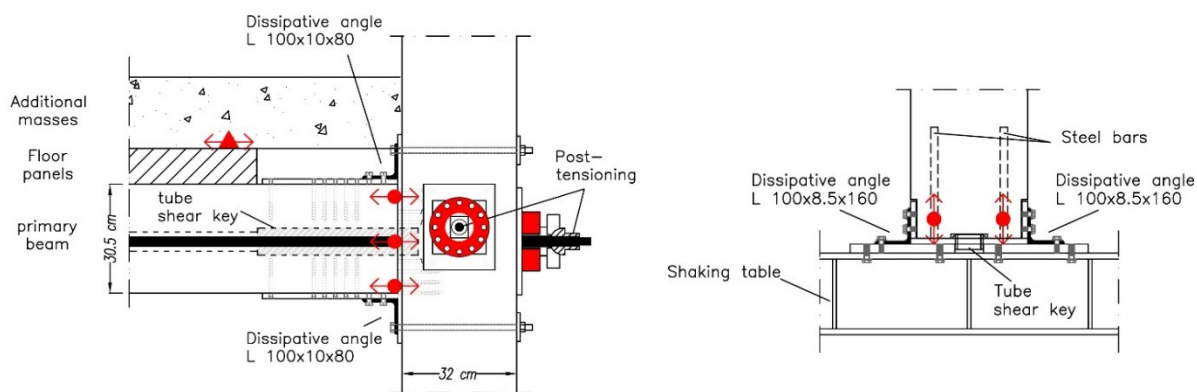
shows the construction details of the beam to column joints and of the column to shake table connections. The beam-column joints (Figure 27a) were composed by a single 26.5 mm diameter steel bar crossing the beam, with  $f_y = 1050$  N/mm<sup>2</sup> yield strength and 170 kN/mm<sup>2</sup> Young's modulus, post-tensioned at 100 kN
